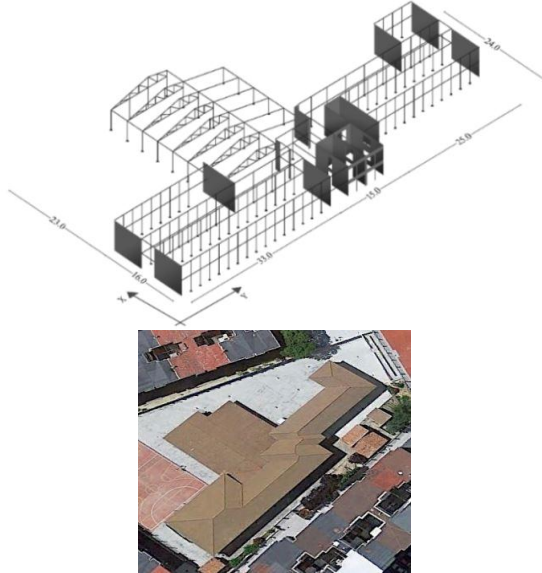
Building type C (irregular shape): mixed structural system (dimensions in meters).
